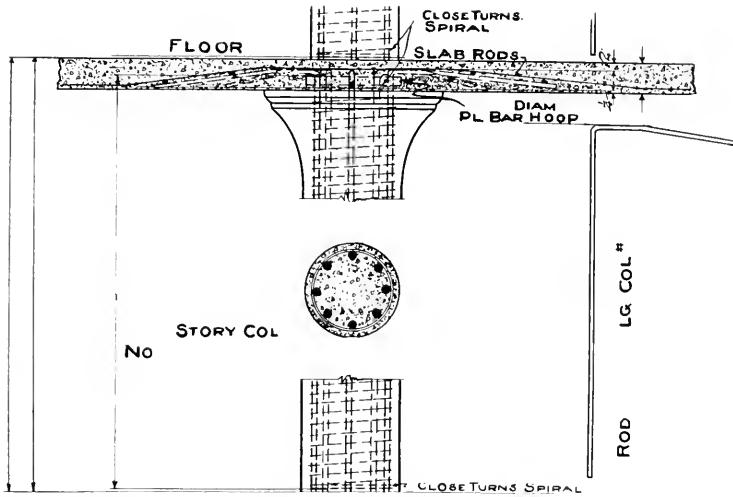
Vertical Section of Standard Mushroom Head showing position of Radial and Ring Rods, and Slab Rods, Vertical and Horizontal Sections of Spirally Hooped Column, with Plain Bar Hoop Collar Band, Vertical Reinforcing Rods and Elbow Rods.
